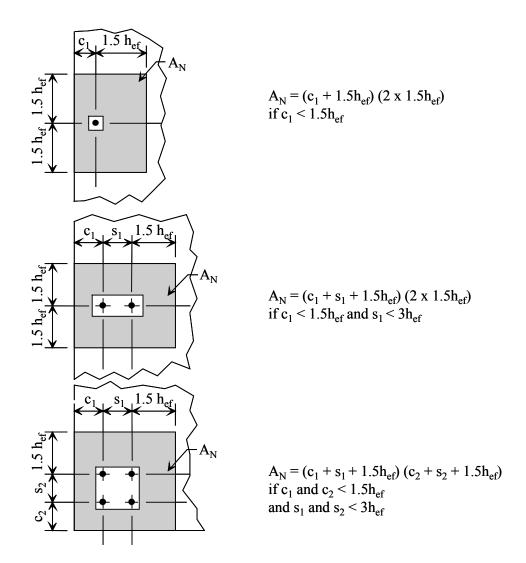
Projected Areas for Single Fasteners and Groups of Fasteners [1.40]
